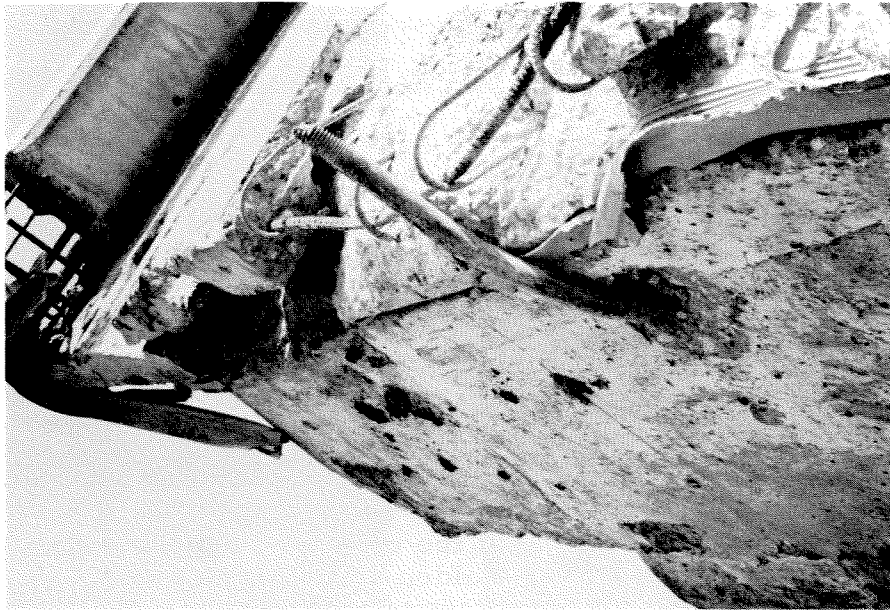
Closeup view of western end of collapsed overcrossing, Golden State-Antelope Valley freeway interchange. The bolt is one of three used to control longitudinal deformation at the joint.
